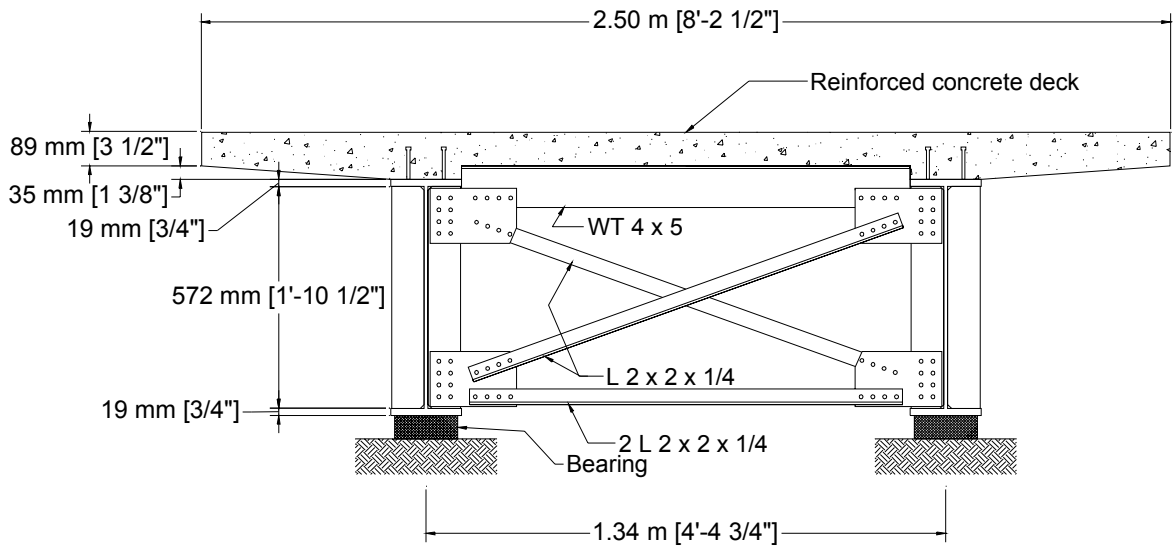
2/5 Scale bridge model - transverse bracing at abutments.
